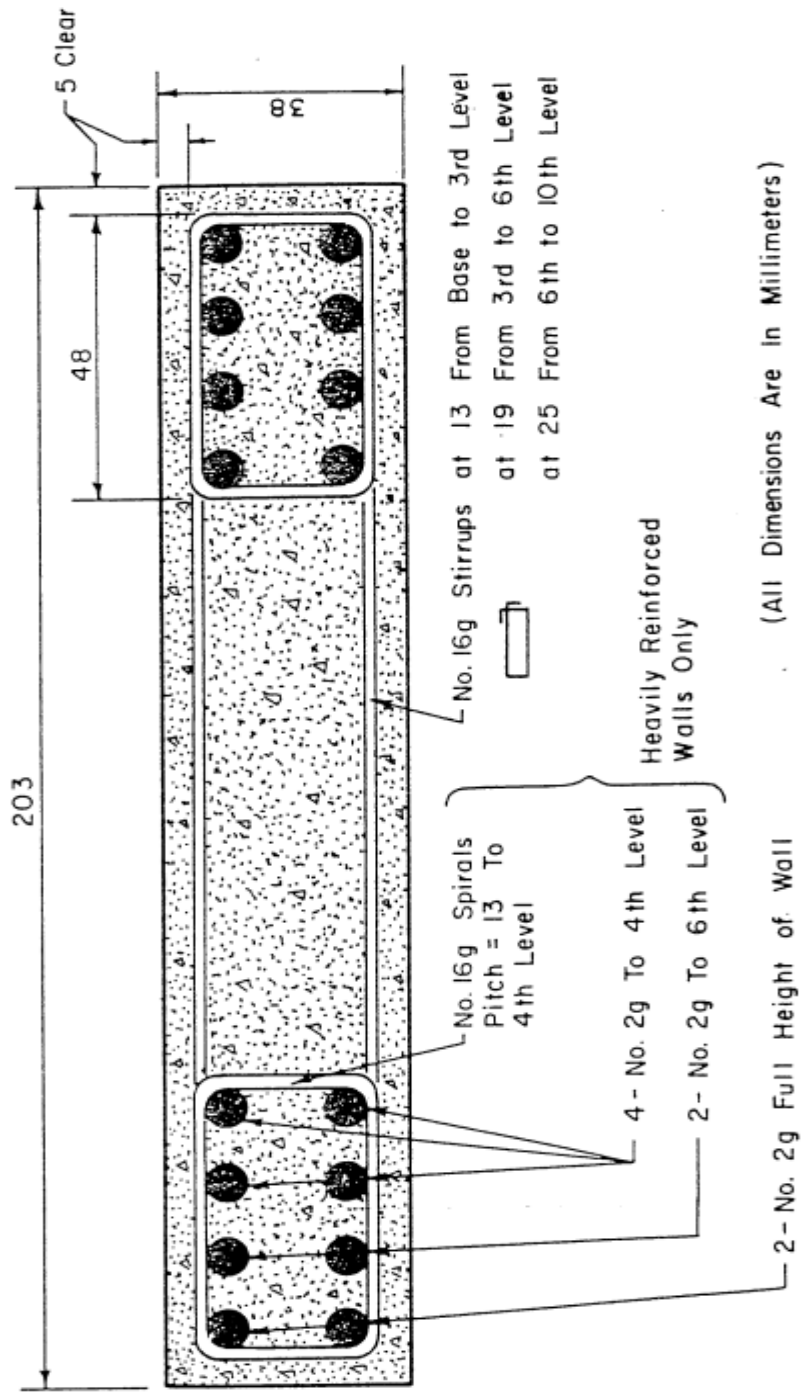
Wall Reinforcement Schedule (Sozen, 1979)
